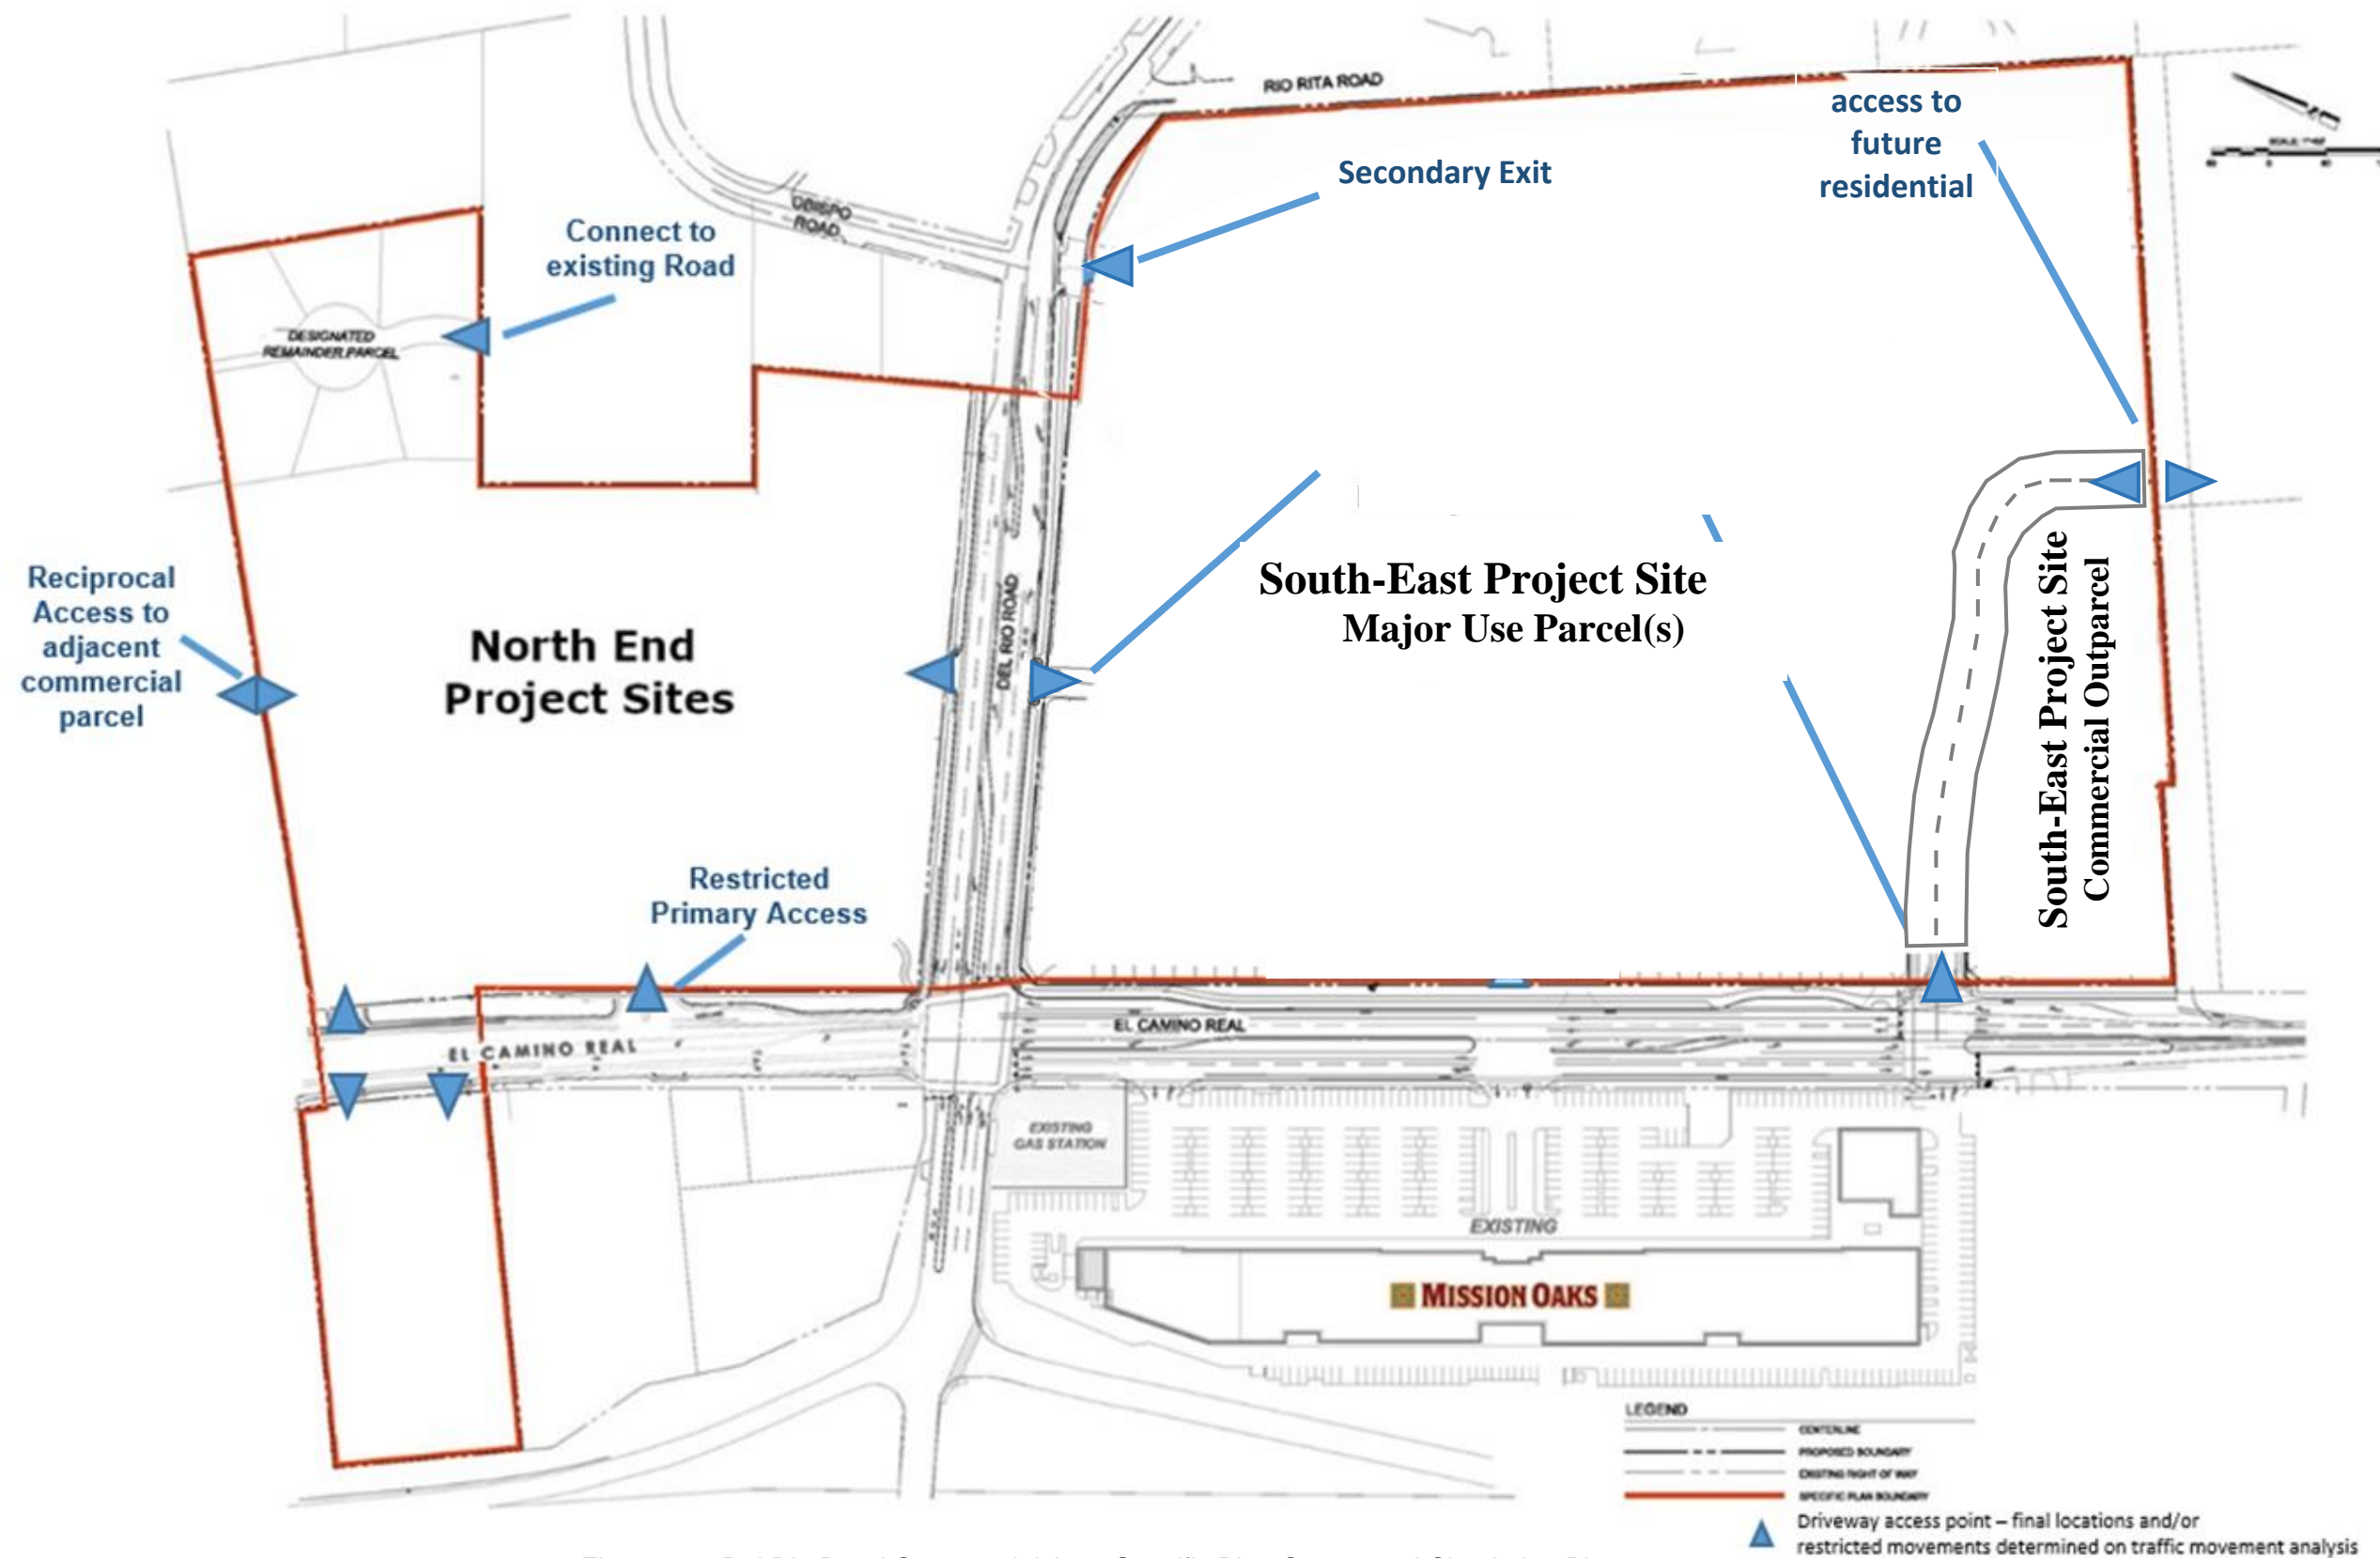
Del Rio Road Commercial Area Specific Plan Conceptual Circulation Plan
